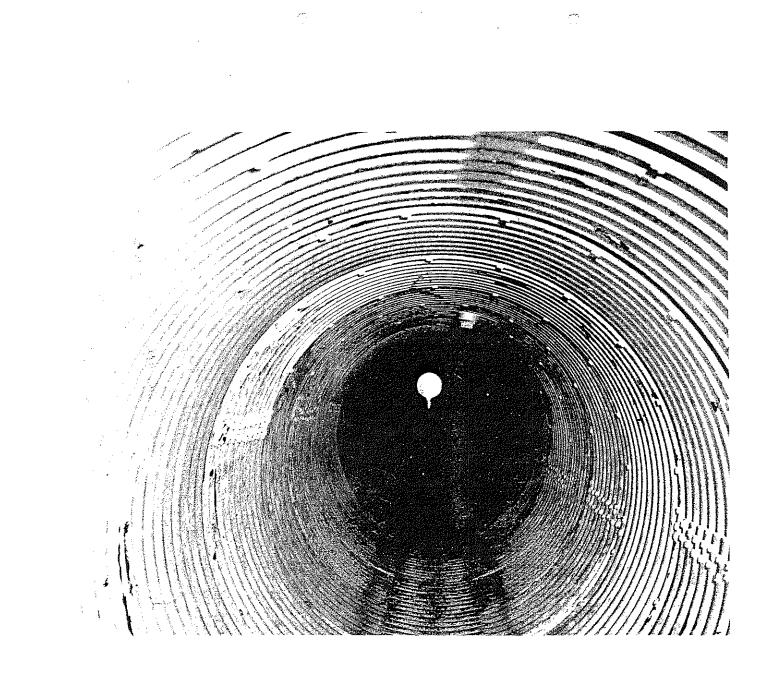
Corrugated metal liner in culvert at Station 1255 + 25 on Project 164-3(3)31 in Shelby County
